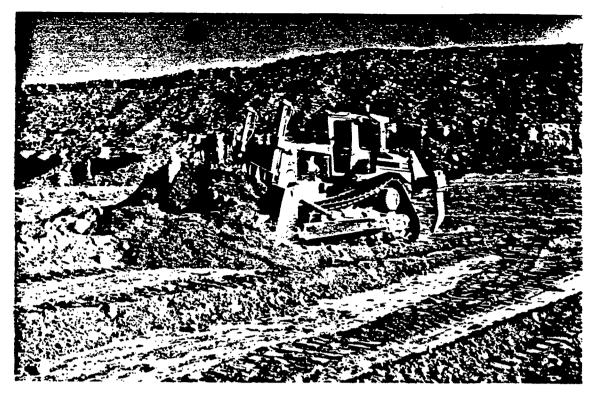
N pushes "clean" fill over burried protore and mine tailings on Section 24 (Brown-Nanabah). Note, Haystack Mountain in background. (photo by Robert Bornstein)
